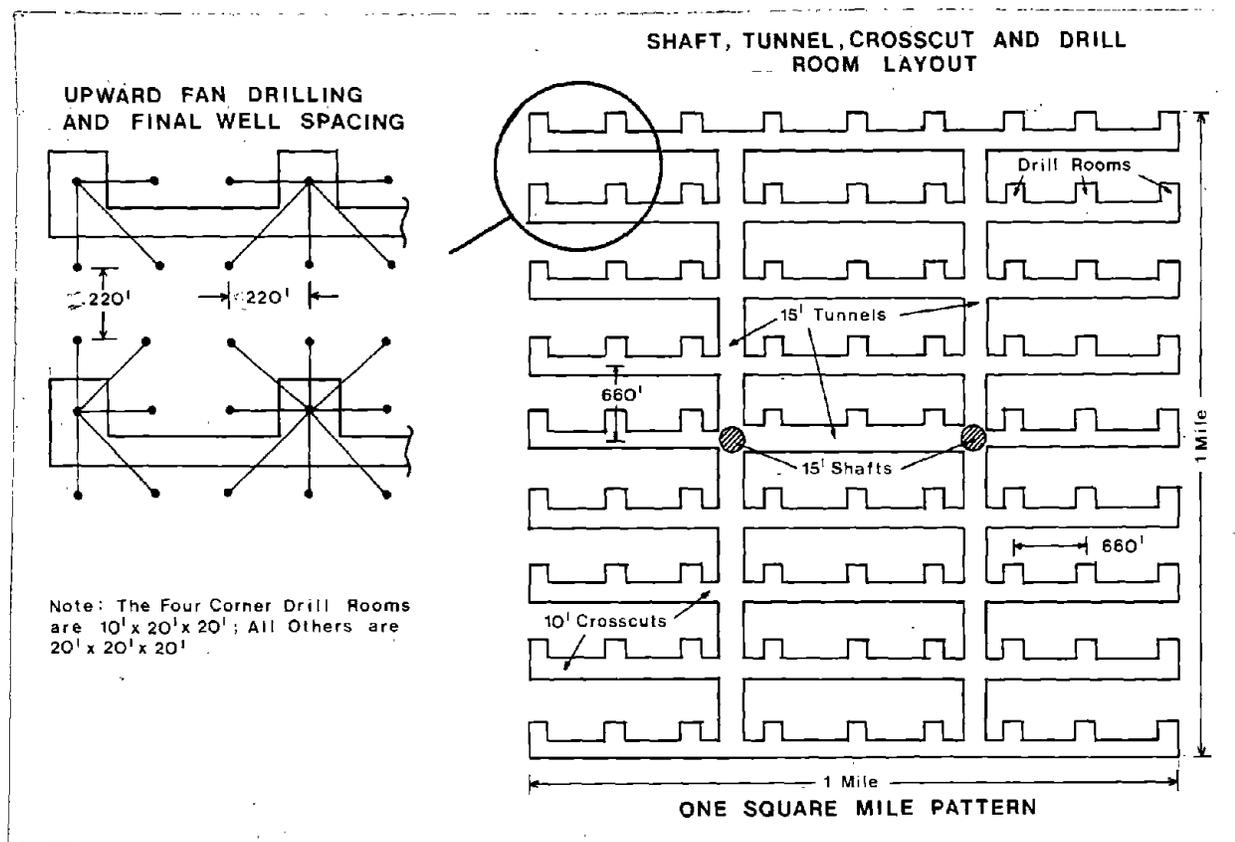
Shaft, tunnel, drift and drilling room layout for gravity drainage.
